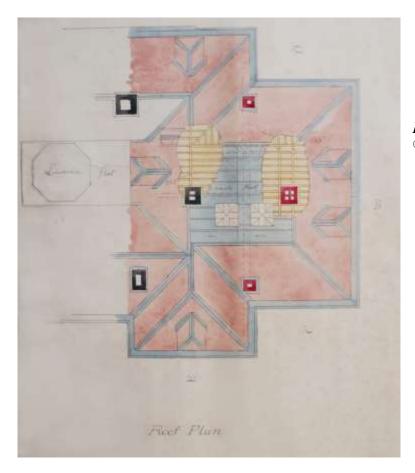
The 1899 Roof plan © The National Archive, Kew
